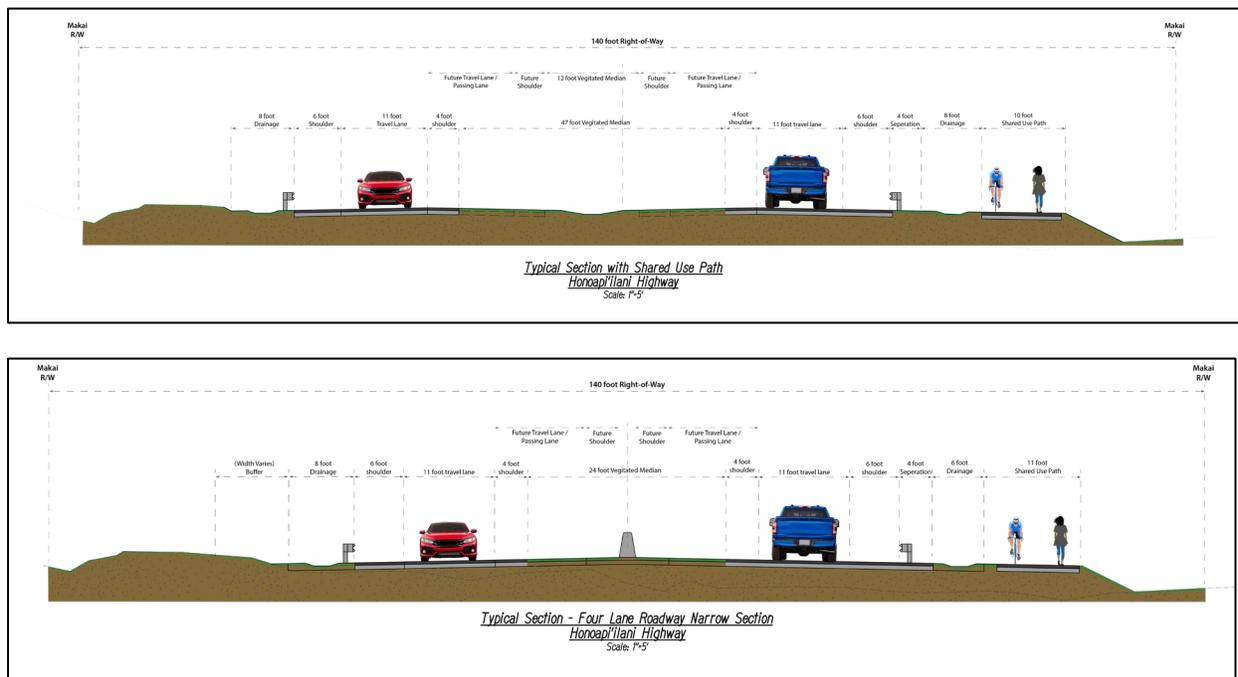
Typical ROW section with two lanes: typical section of realigned highway with shared use path (above); typical narrow section of highway with shared use path (below). (Image credits: FHWA)
